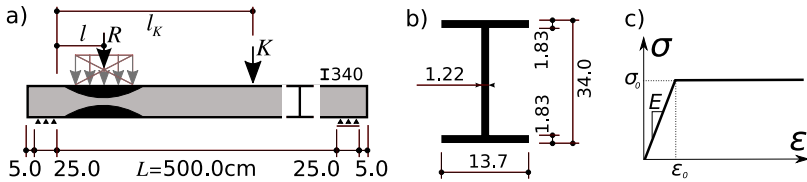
a) Investigated steel beam, b) Dimensions of beam cross-section, c) Assumed material model
